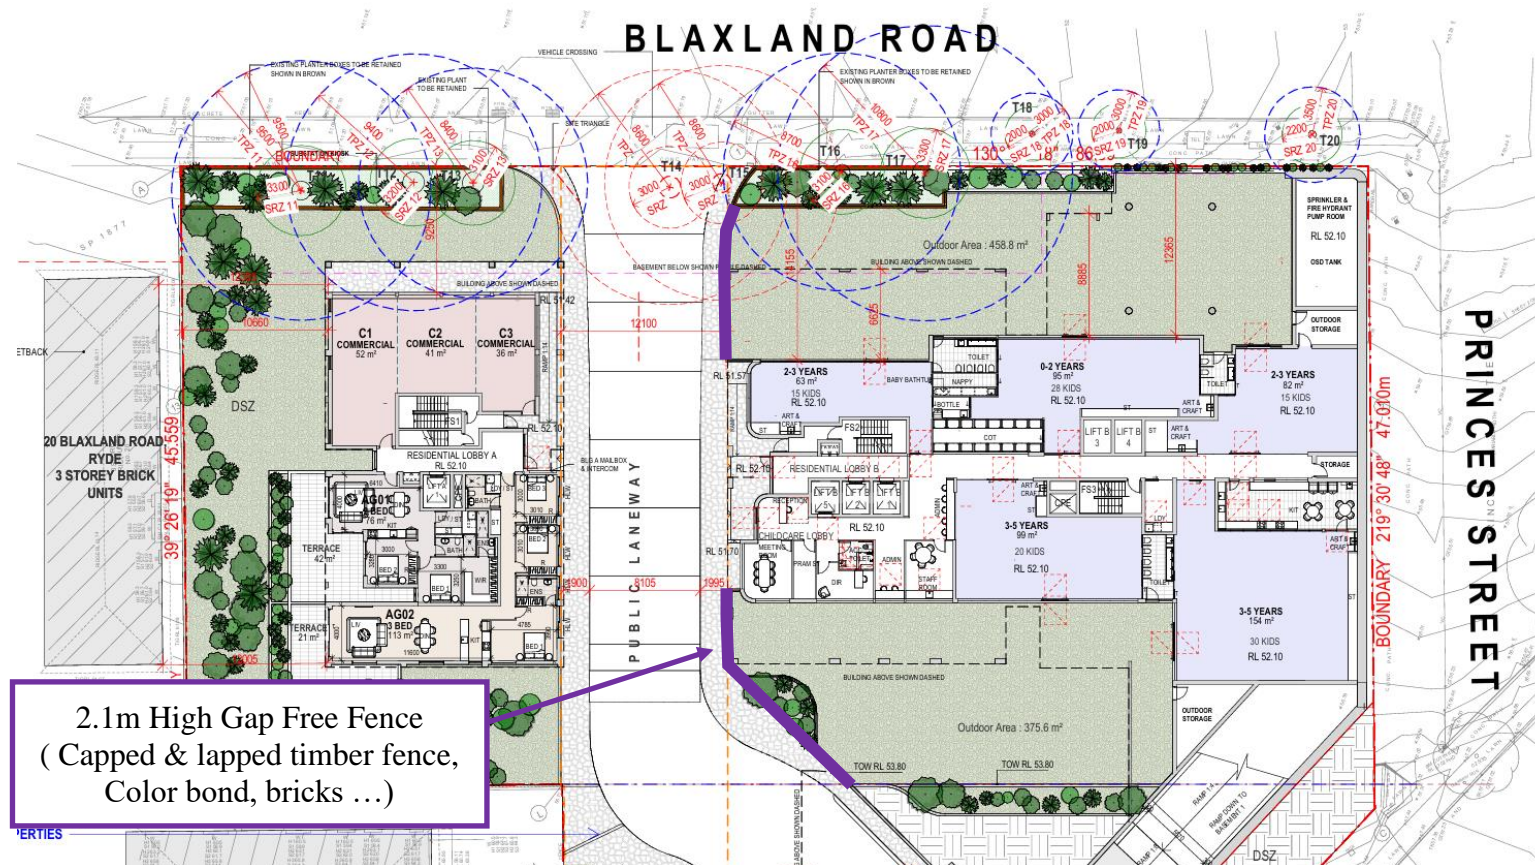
Proposed Sound Barriers (Outdoor Common Areas)
